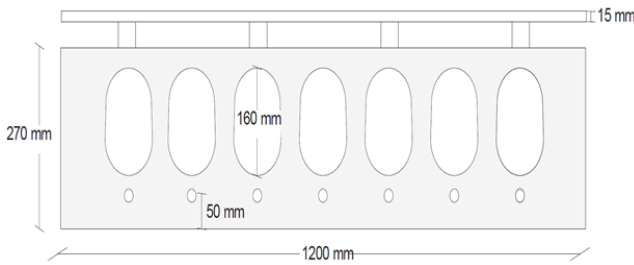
Descriptive geometry of one prefabricated concrete deck
